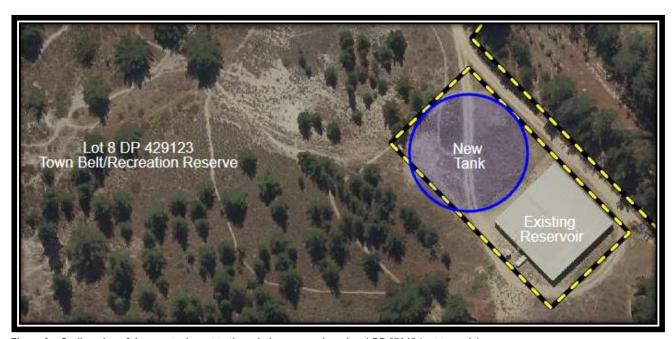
Outline plan of the new tank next to the existing reservoir on Lot 1 DP 27045 (not to scale).
